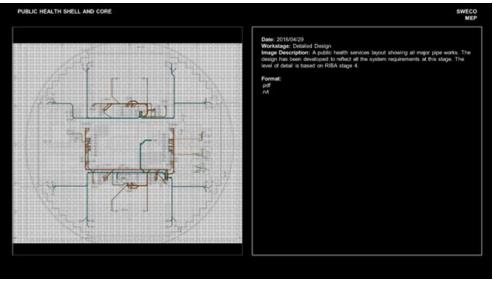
c.12 - Typical stage 4 Shell and Core Public Health Layout
